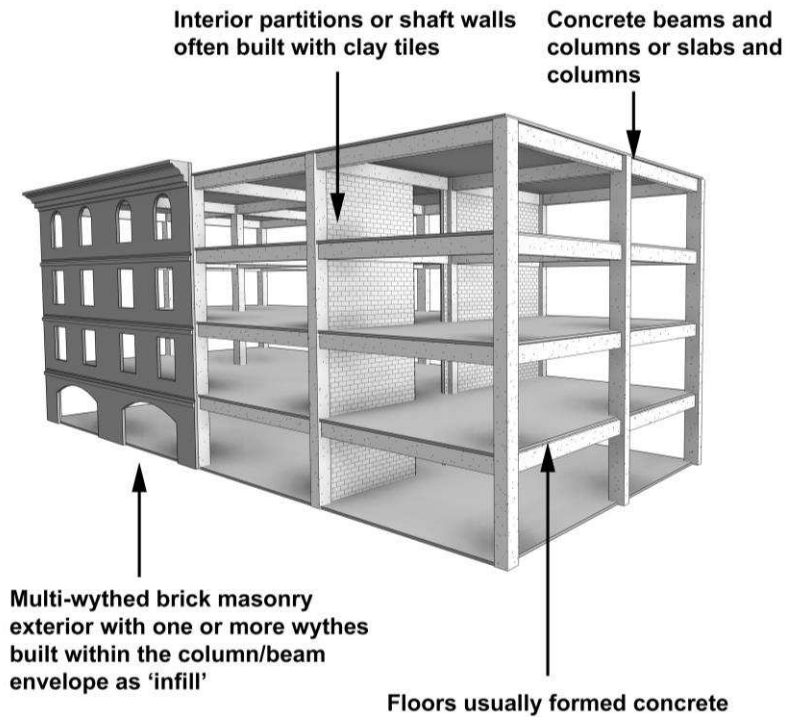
Schematic illustration of a CIW building (Figure adapted from FEMA 547, FEMA, 2006)
